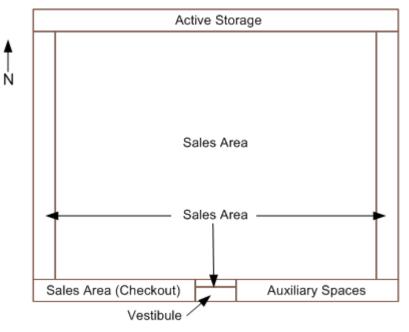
Medium Box Retail Store Prototype Model Floor Plan
